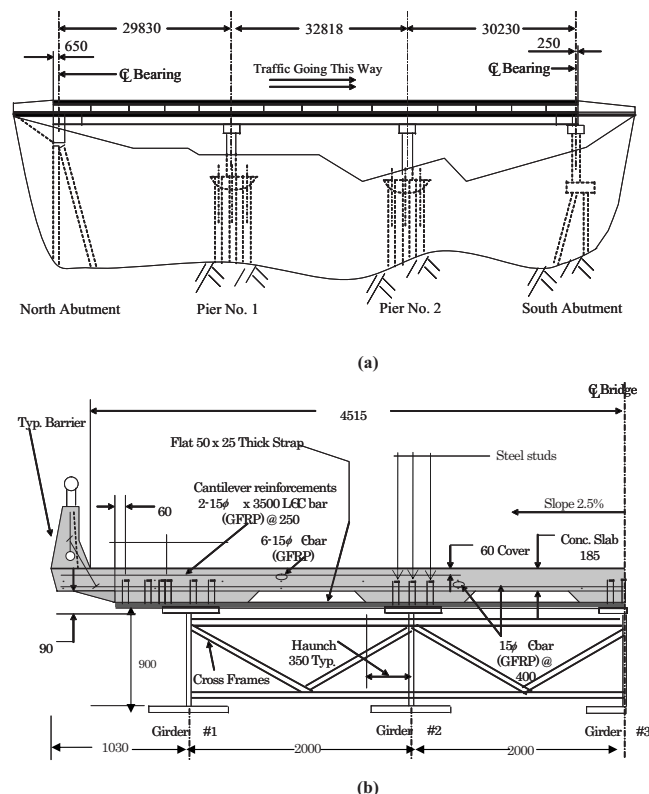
Details of the Crowchild Bridge—(a) west elevation; (b) cross section
